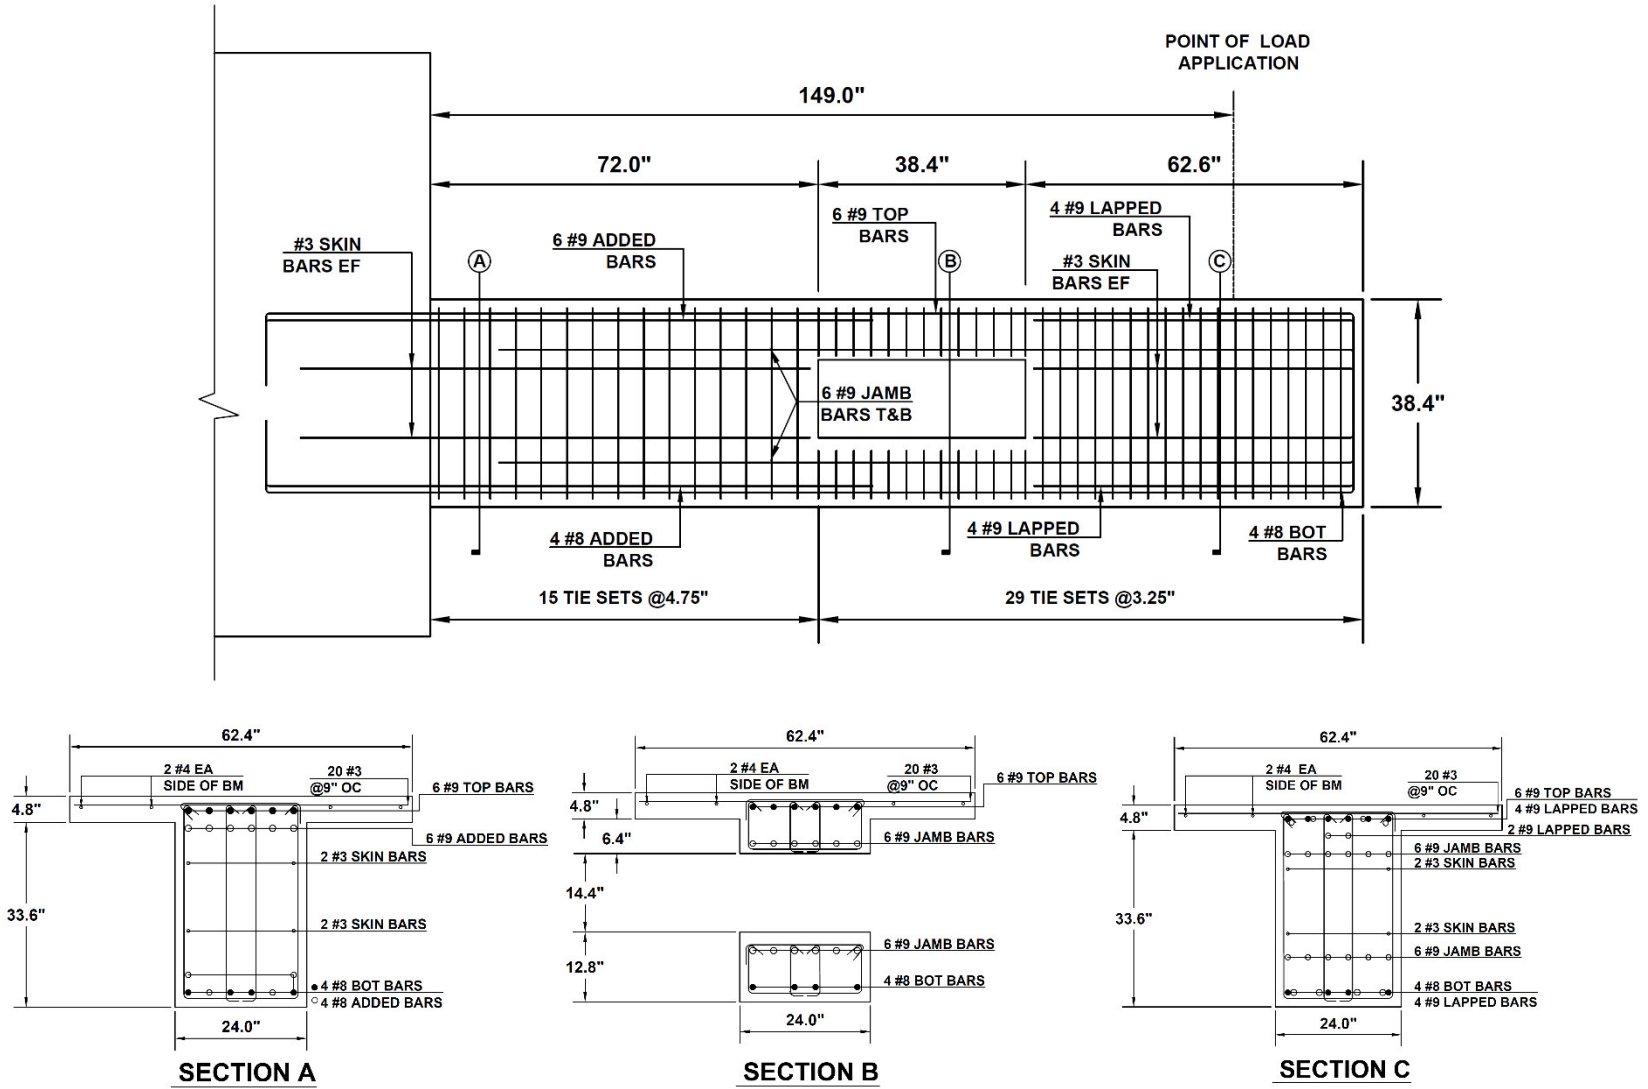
Beam elevation geometry and reinforcement details for S2
